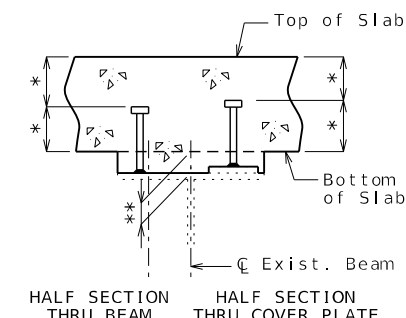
DETAILS OF CONCRETE REMOVAL AND UNFORMED REPAIR AT END BENTS
